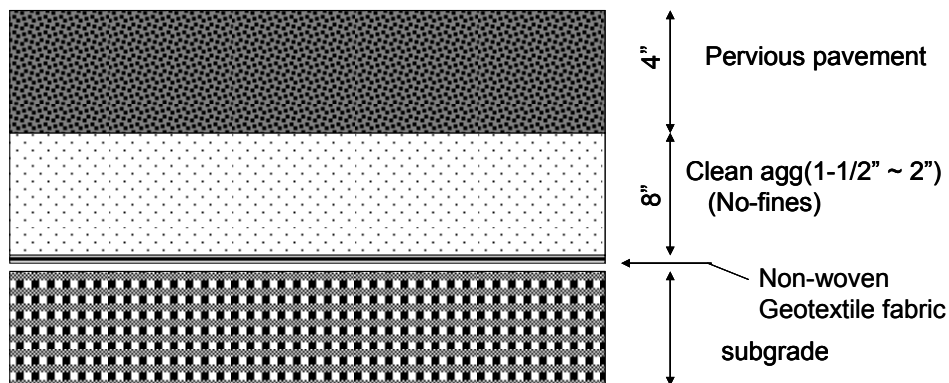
Typical parking & driveway pervious concrete pavement, after (www.stonecreekmaterials.com).
